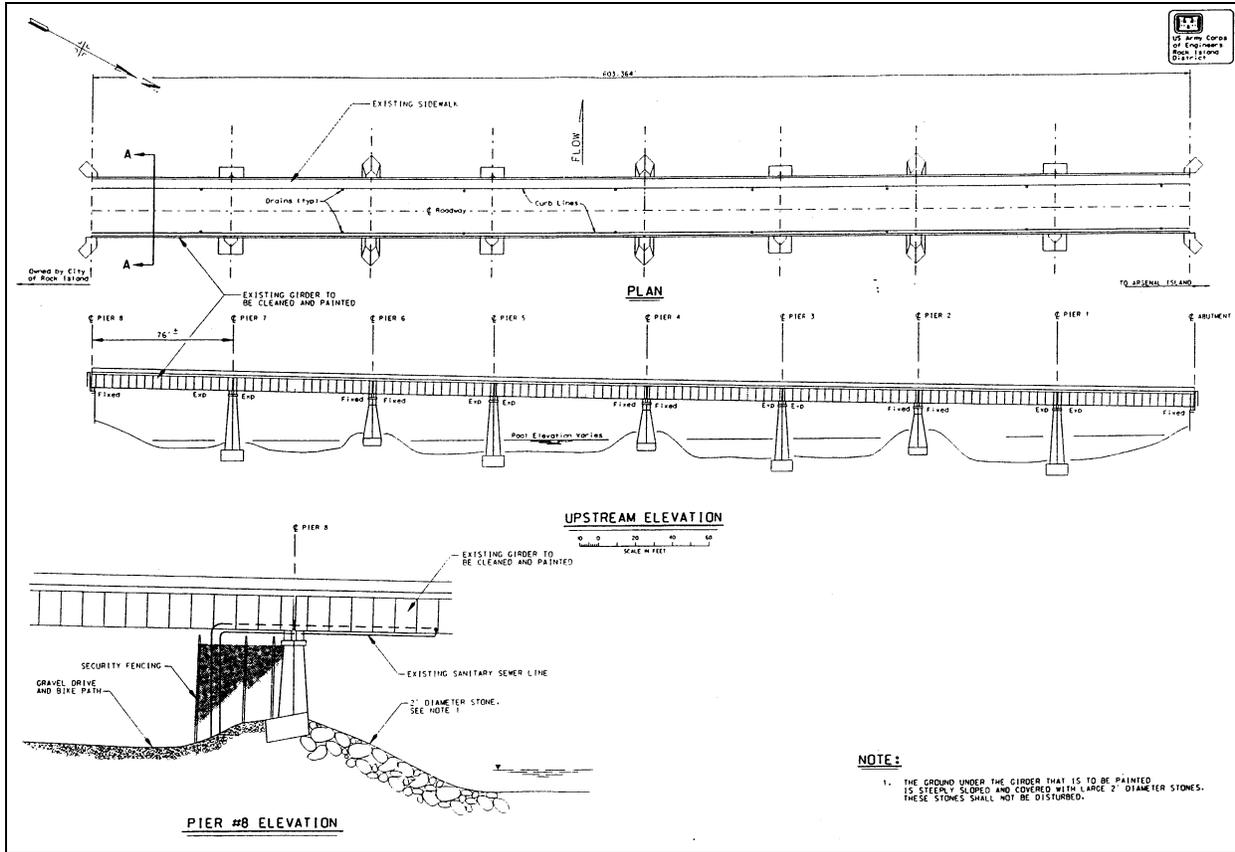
Upstream elevation drawing of the Viaduct Bridge.
